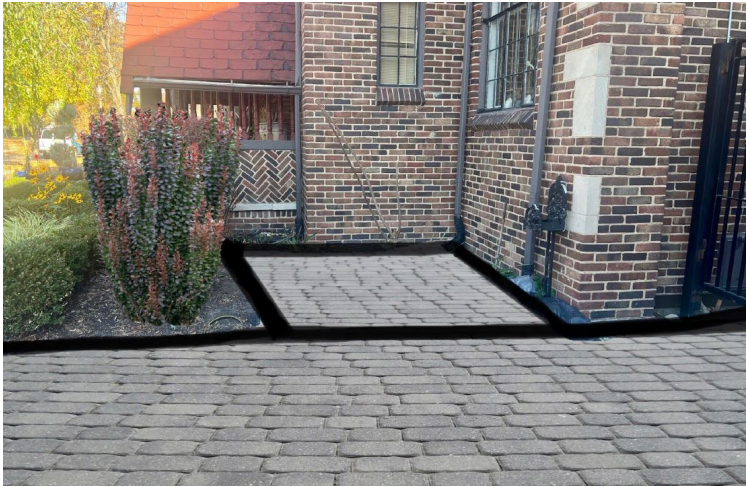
, by Applicant: Southwest corner of house, showing proposed garbage/recycling storage pad
